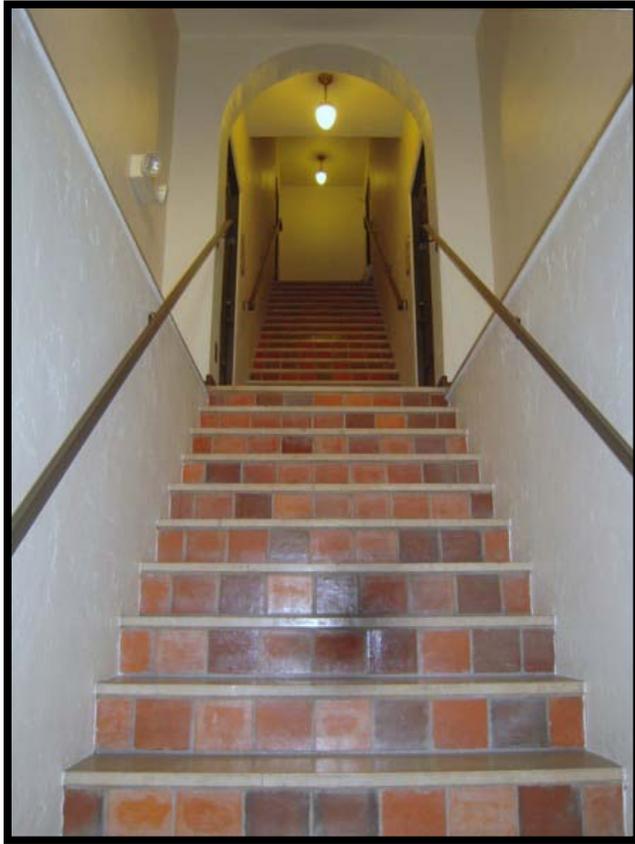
The only common spaces are the central staircase in each wing; they are clad with terra cotta tile and each serves two units on each floor.
